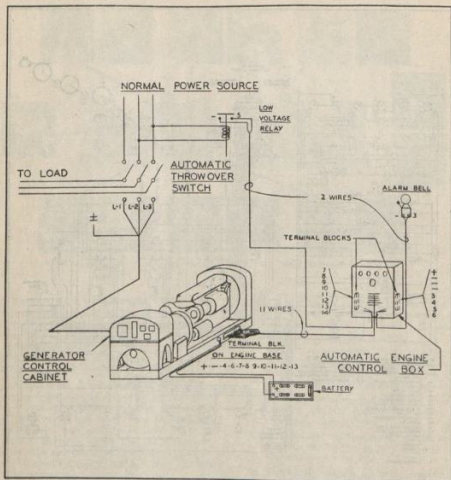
Typical Installation of Diesel Engine Driven Generator Set equipped with Automatic Engine Starting and Throwover.
